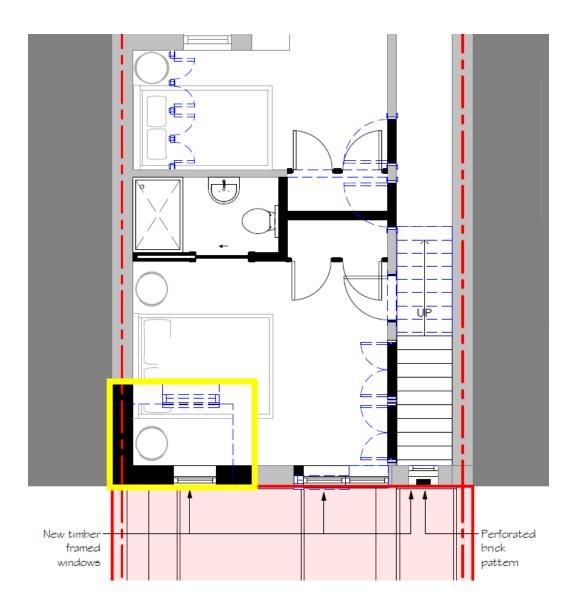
Proposed first floor extension on the rear elevation highlighted in yellow.
